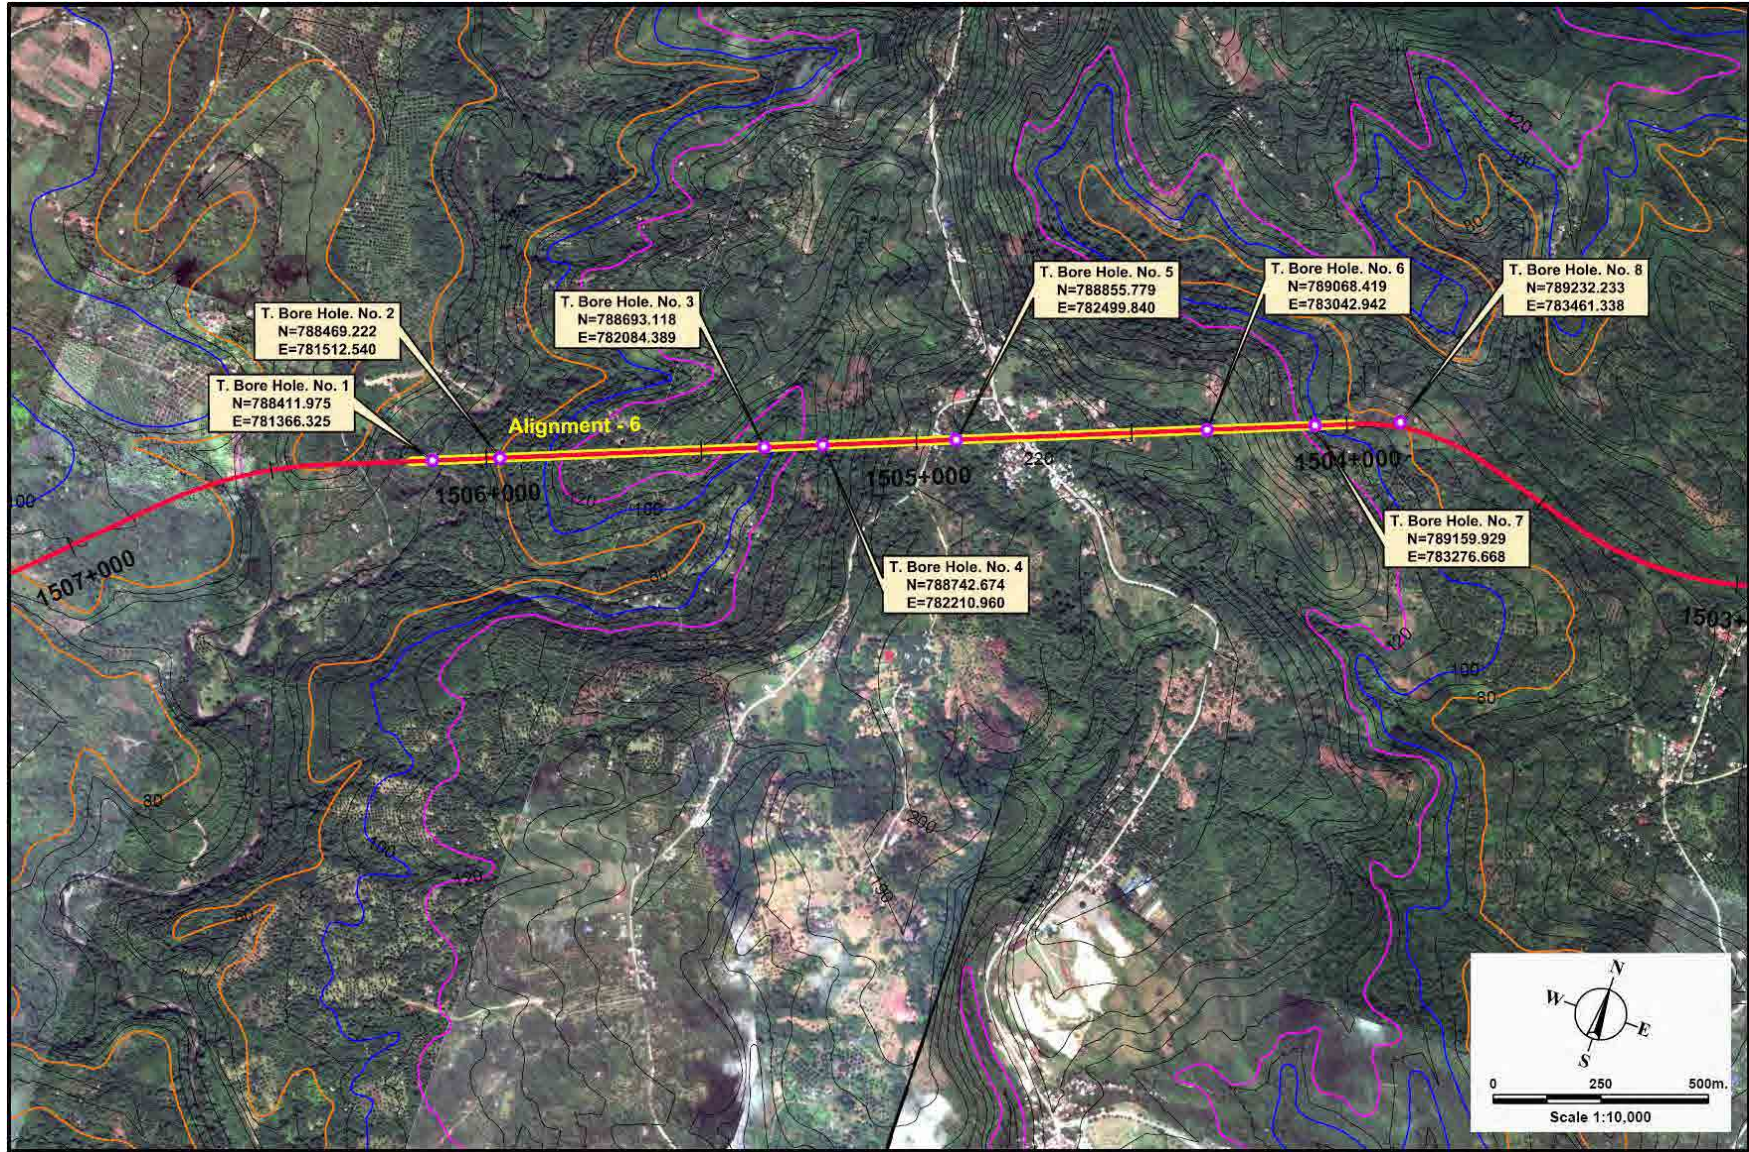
TUNNEL SECTION BORING LOCATION MAP
